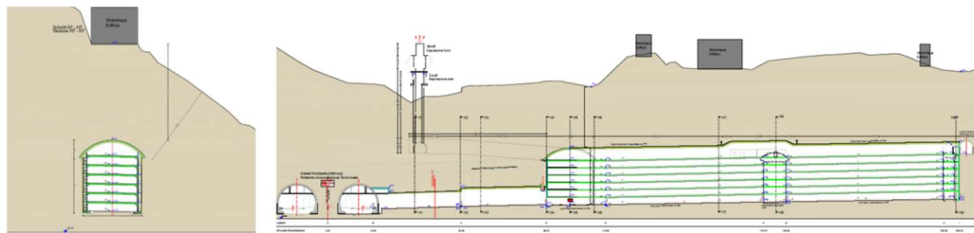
Typical section and longitudinal profile of the car parking cavern with underground roundabout (property of the authors).
